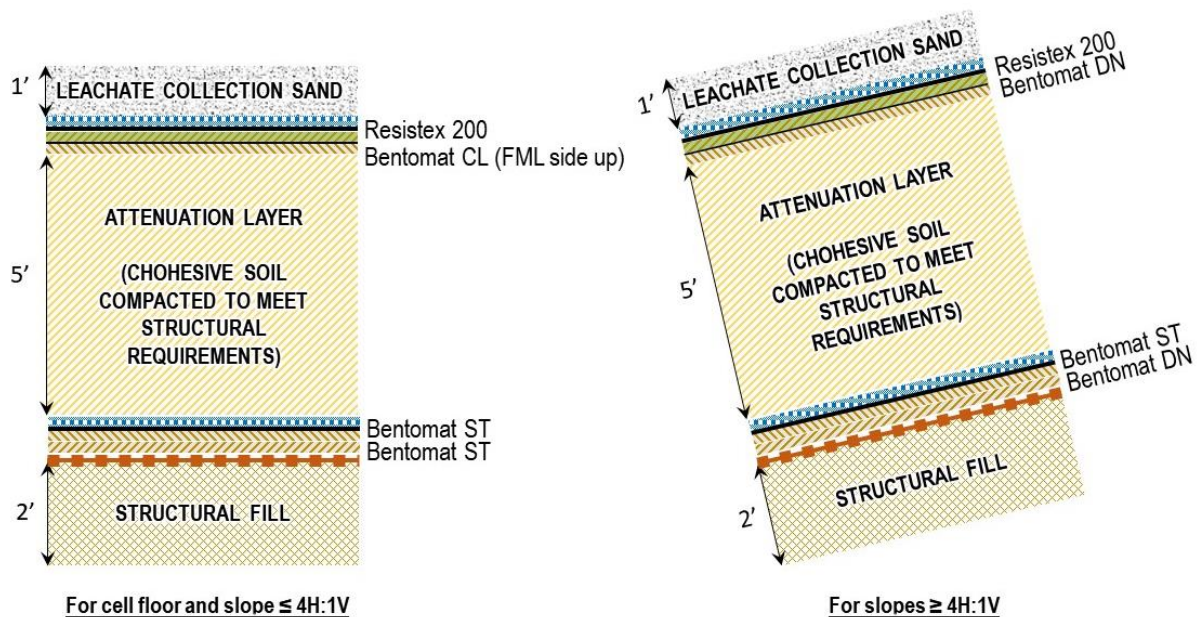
Proposed MC VI-G Phase 2 Base Liner Construction Detail.
